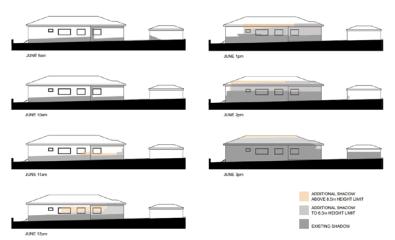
Overshadowing plans in elevation on No. 20 Kembla Street at mid-winter
